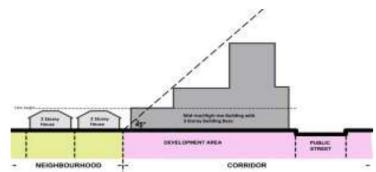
Angular plane when a street does not separate Neighbourhood designation from Centre or Corridor. A building structure up to 10 metres in height may protrude into the angular plane.
